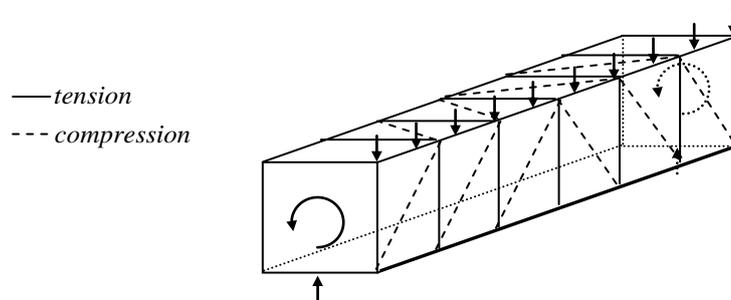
Truss model of a cracked reinforced concrete beam subjected to torsion.
